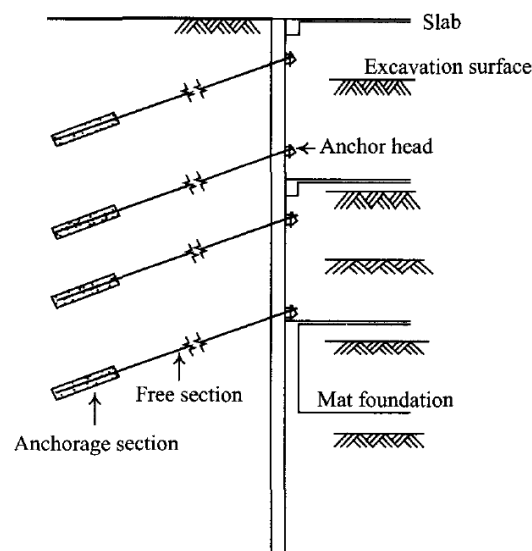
Anchored Retaining Wall Profile View (Ou, 2006)
